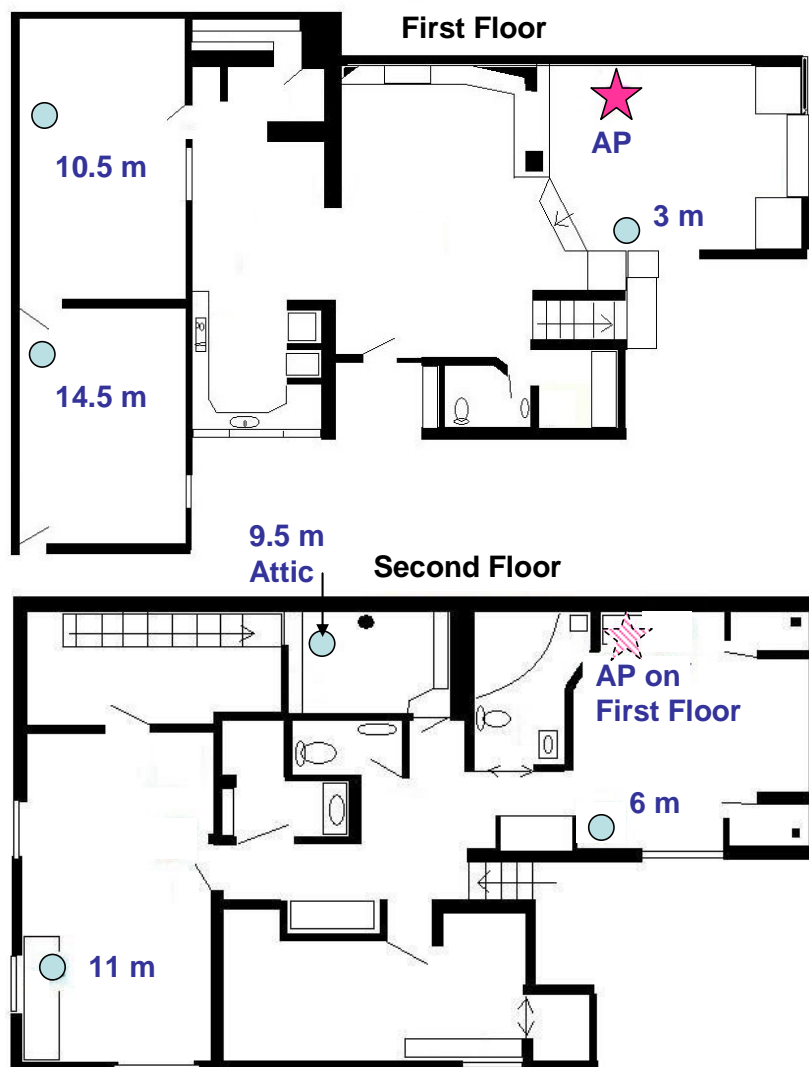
Floor plan of the house The AP was located on the first floor while the client was moved to the designated points. The 9.5 meter point was actually located in the attic above the second floor. The house is built of stone and concrete materials, creating a challenging environment for RF propagation.
